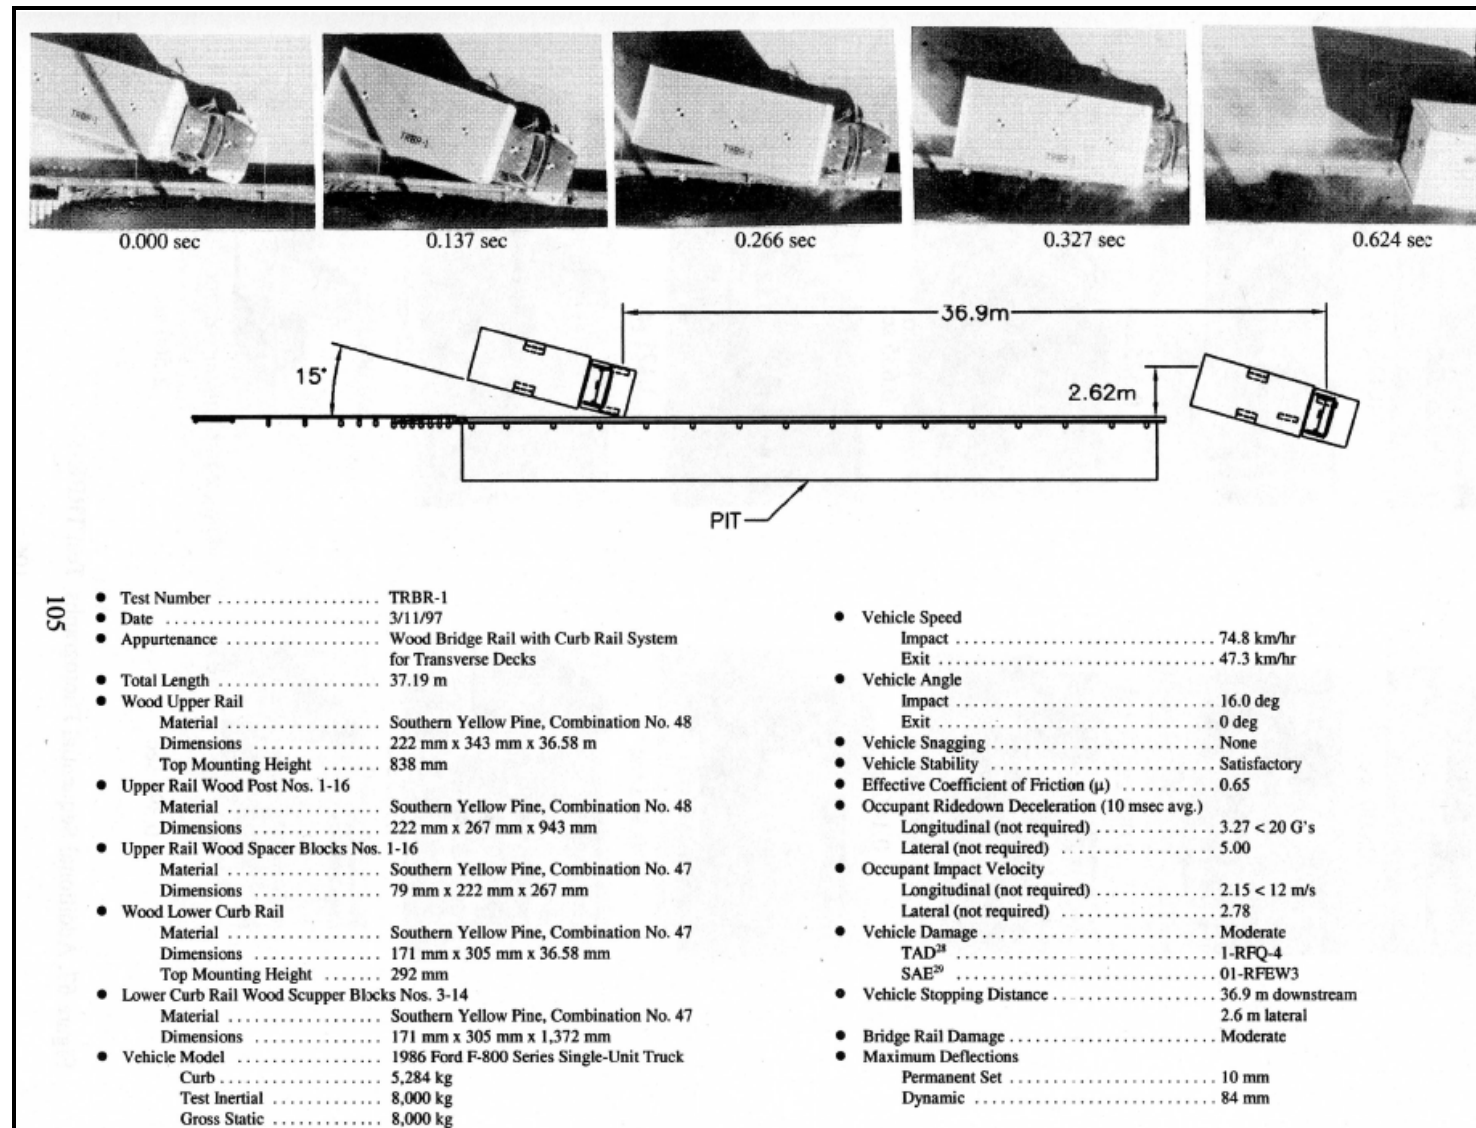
FPL Glulam Bridge Rail TL-4 Test 1
